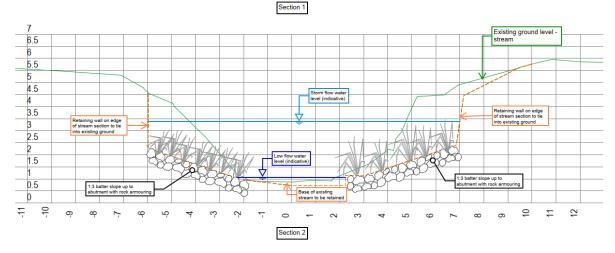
Walmsley Road Bridge preferred cross sections. Section 1 presents a cross section through the Walmsley Road Bridge, Section 2 presents cross sections immediately downstream of the bridge. Note that soffit levels presented are not refering to the bridge soffit. Levels presented are in NZVD2016.
